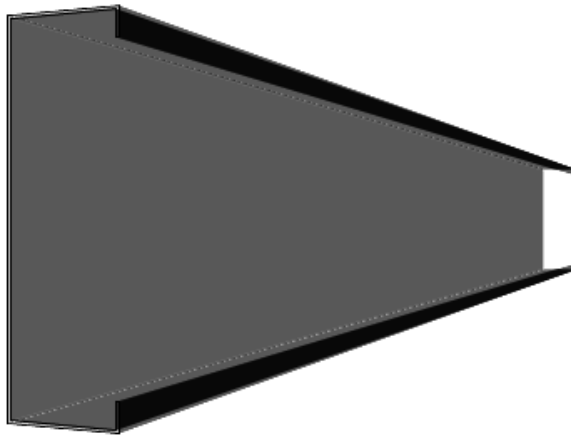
Loading of cold-formed thin-walled cantilever beam with C-section.
